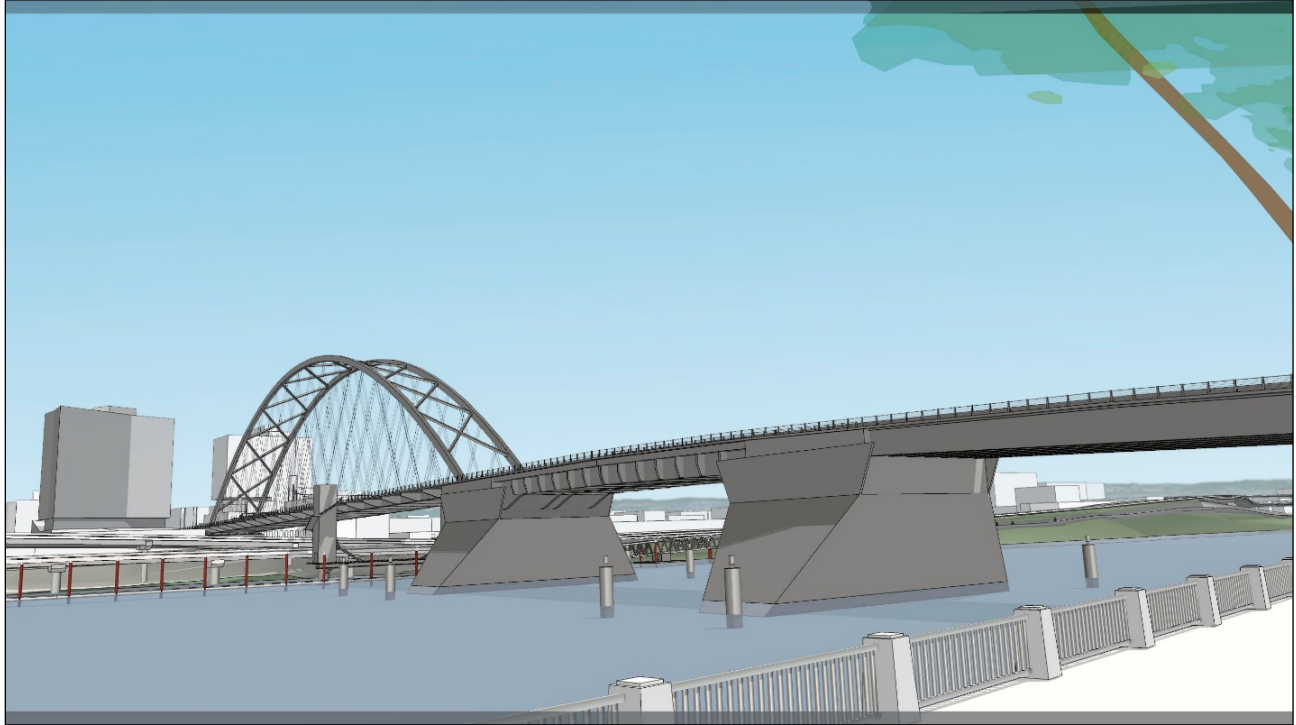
Span Combination 1 (girder west approach, bascule central span, tied arch east approach), artist's rendering, view looking southeast (Fat Pencil Studio, 2021).
